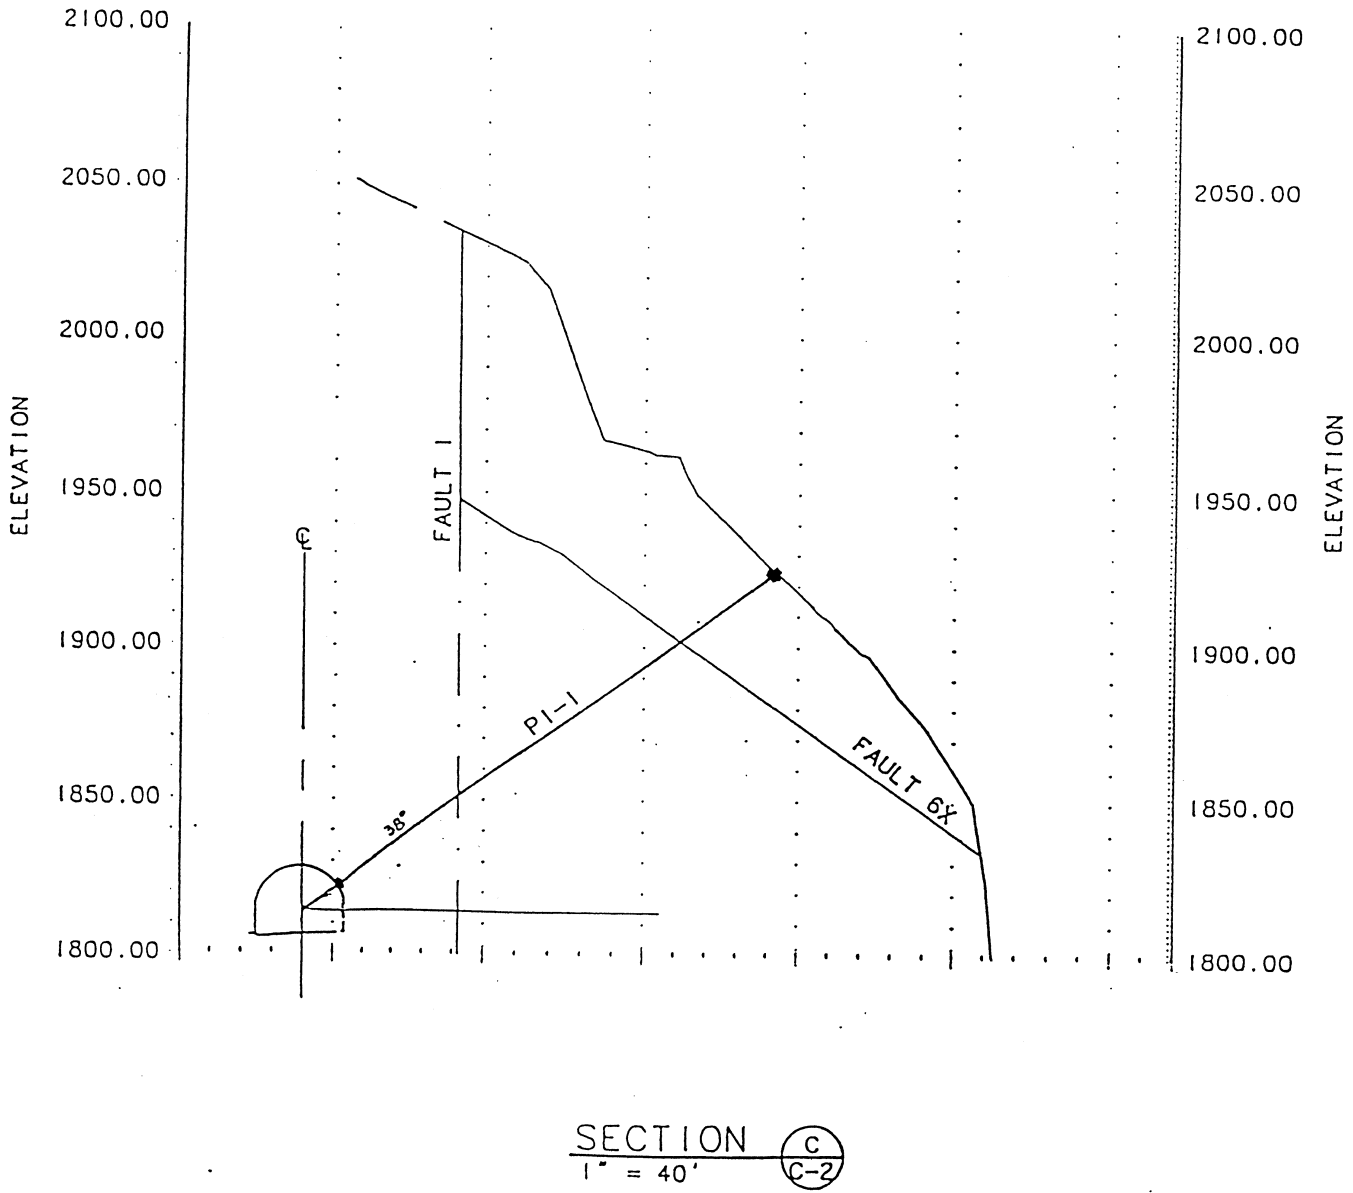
Schematic representation of prestressed anchors. Boundary Dam, WA.
